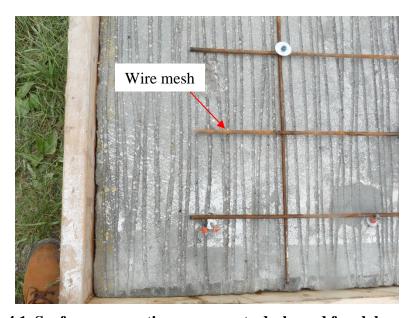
Surface preparation on concrete deck used for slab specimens
